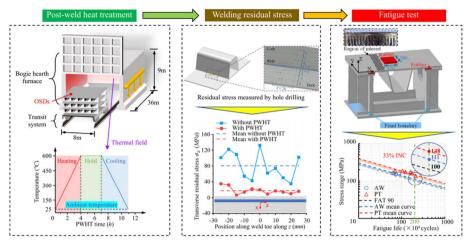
Study on fatigue resistance of annealed steel deck after welding
